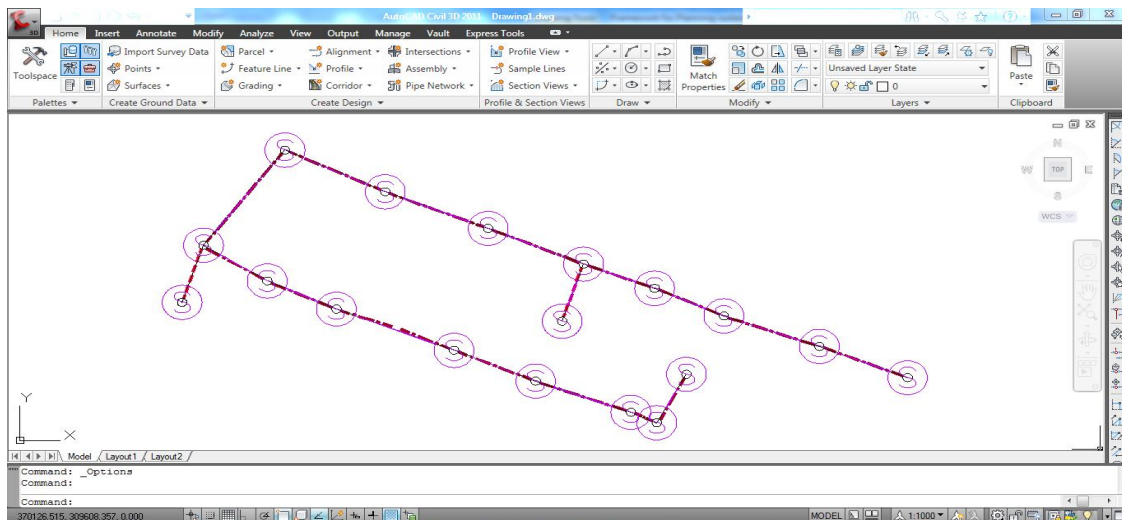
A Plan of the Developed Sewer Sample on AutoCAD Civil3D
